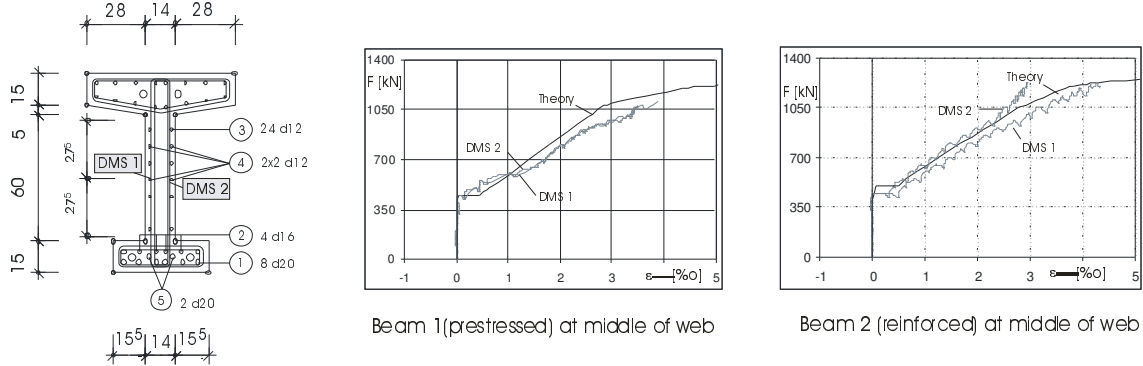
Cross section and strains in the stirrups of beam 1 and 2
